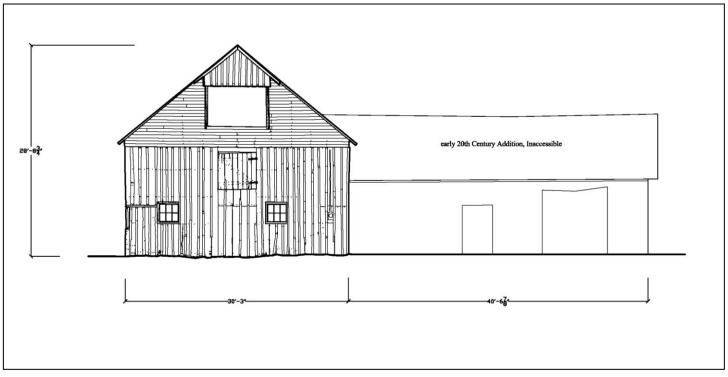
The east elevation of the Houseworth barn. Upon closer inspection it appears that at one point there were three entryways on this elevation, one central and two to the side.
